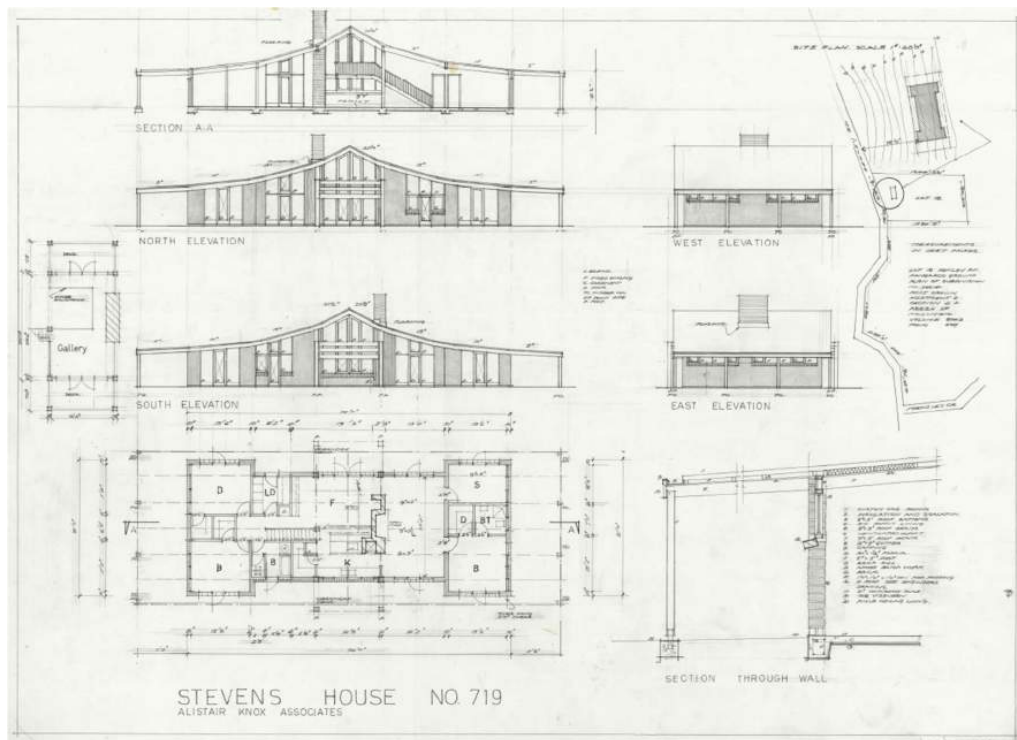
Plans by Alistair Knox for the subject house for the Stevens family, c1973. (Source: Alistair Knox c1973, YLTAD28-371, SLV)
